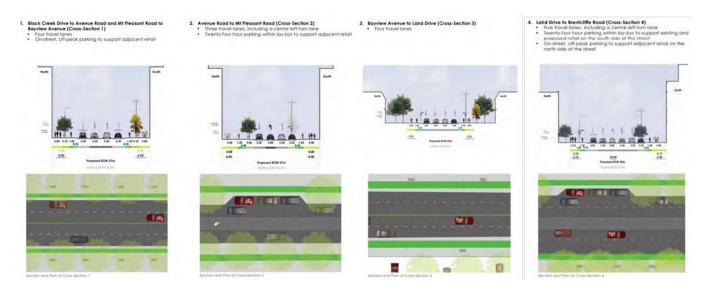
Eglinton Cross-Sections - Black Creek Drive to Brentcliff Road
